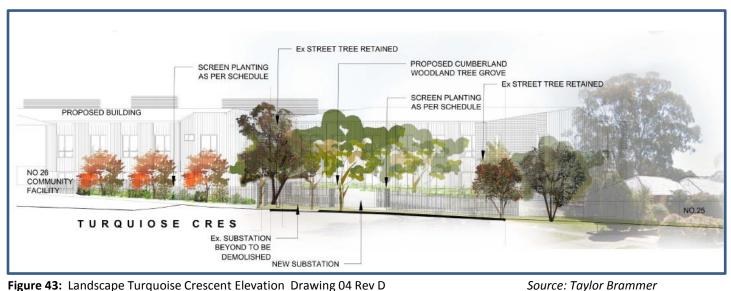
Landscape Turquoise Crescent Elevation Drawing 04 Rev D
